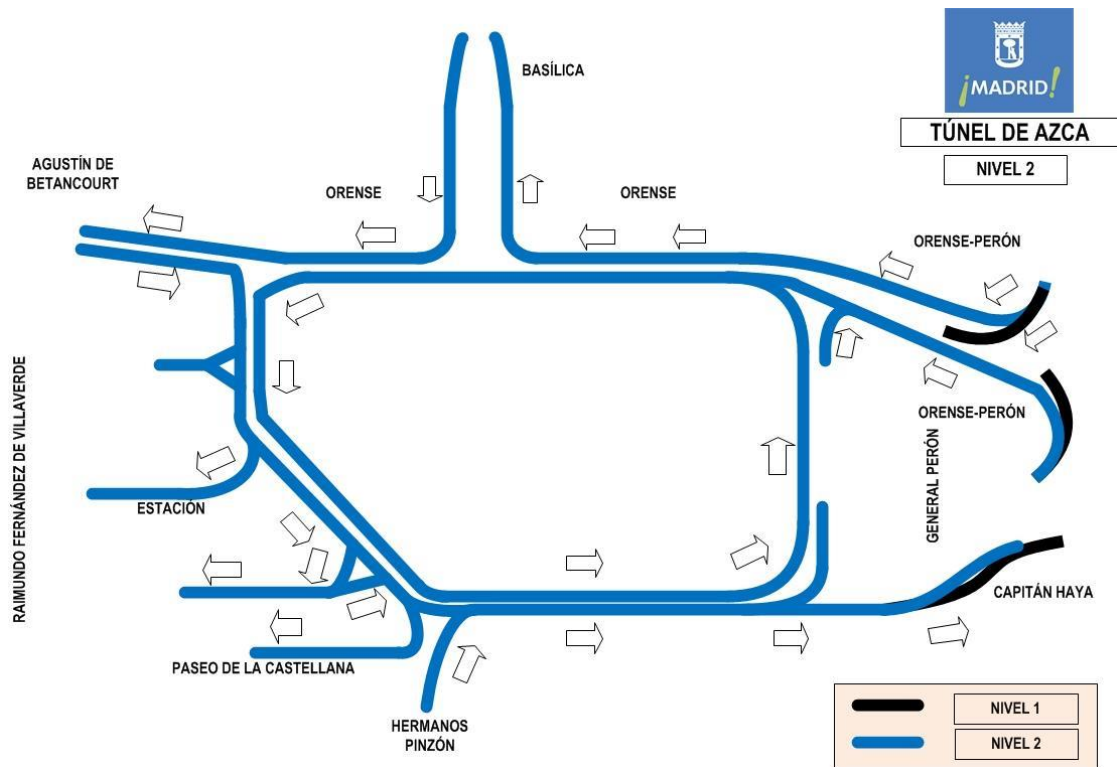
Detail of ramps and traffic direction for Azca Tunnel at Level 2 (Blue colour)
